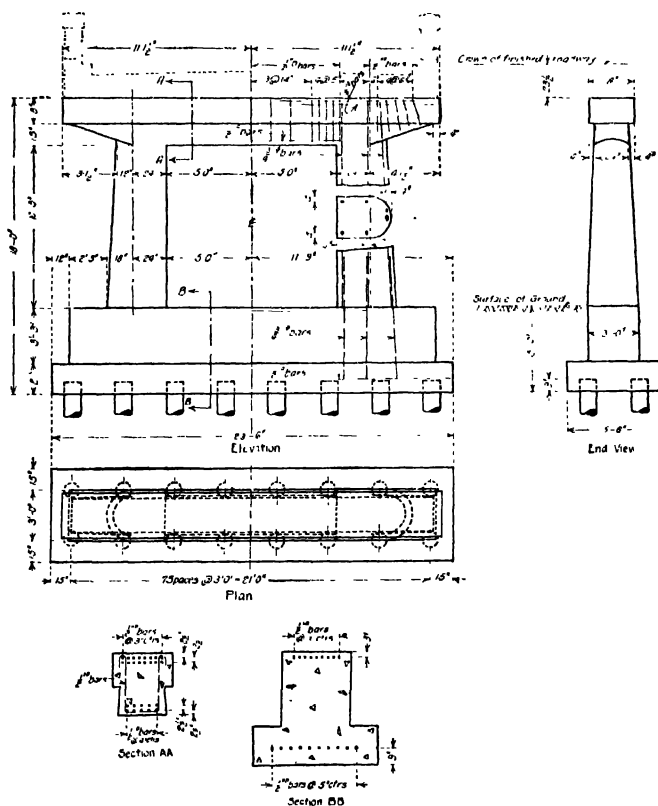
Details of pier for bridge over Little Wabash River near Louisville, Illinois.
